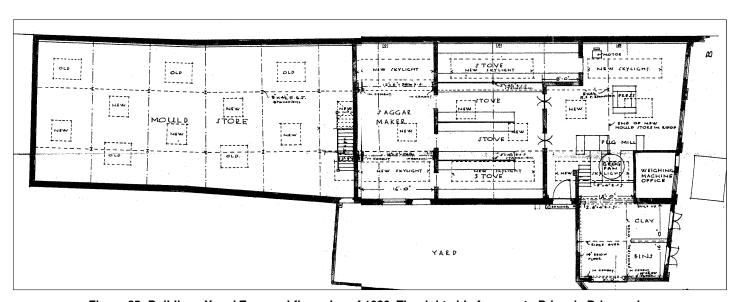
Buildings Y and Z ground floor plan of 1929. The right side faces onto Prince's Drive and Mill Street lies to the top. The wing to the right bottom (clay bins) lies beyond the 1898 boundary (see Figures 32 and 33). The Weigh House and bridge lie in the area nearest to the wing for weighing clay.²⁹
